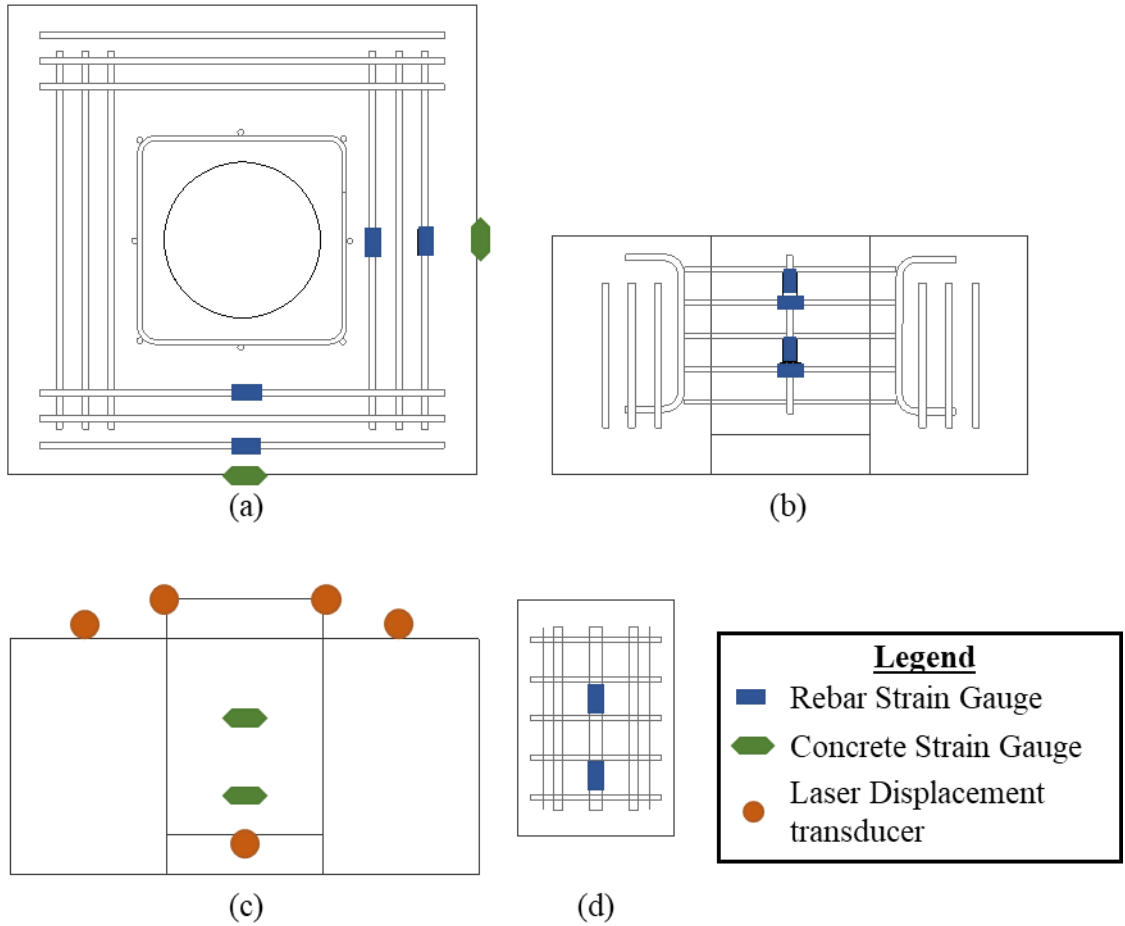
Instrumentation plan for Series II and III specimens: (a) pile-cap bottom view (b) cap-elevation, (c) plan cap, and (d) plug elevation.
